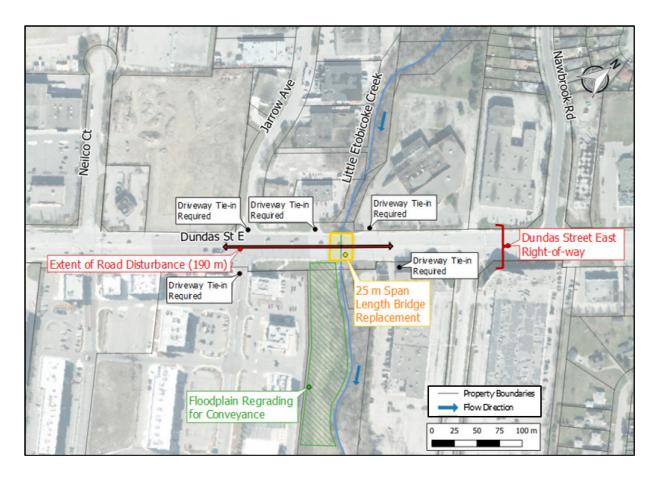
Dundas Area Alternative Solution 1: 25 m Single-span Bridge with Downstream Floodplain Conveyance Improvements
